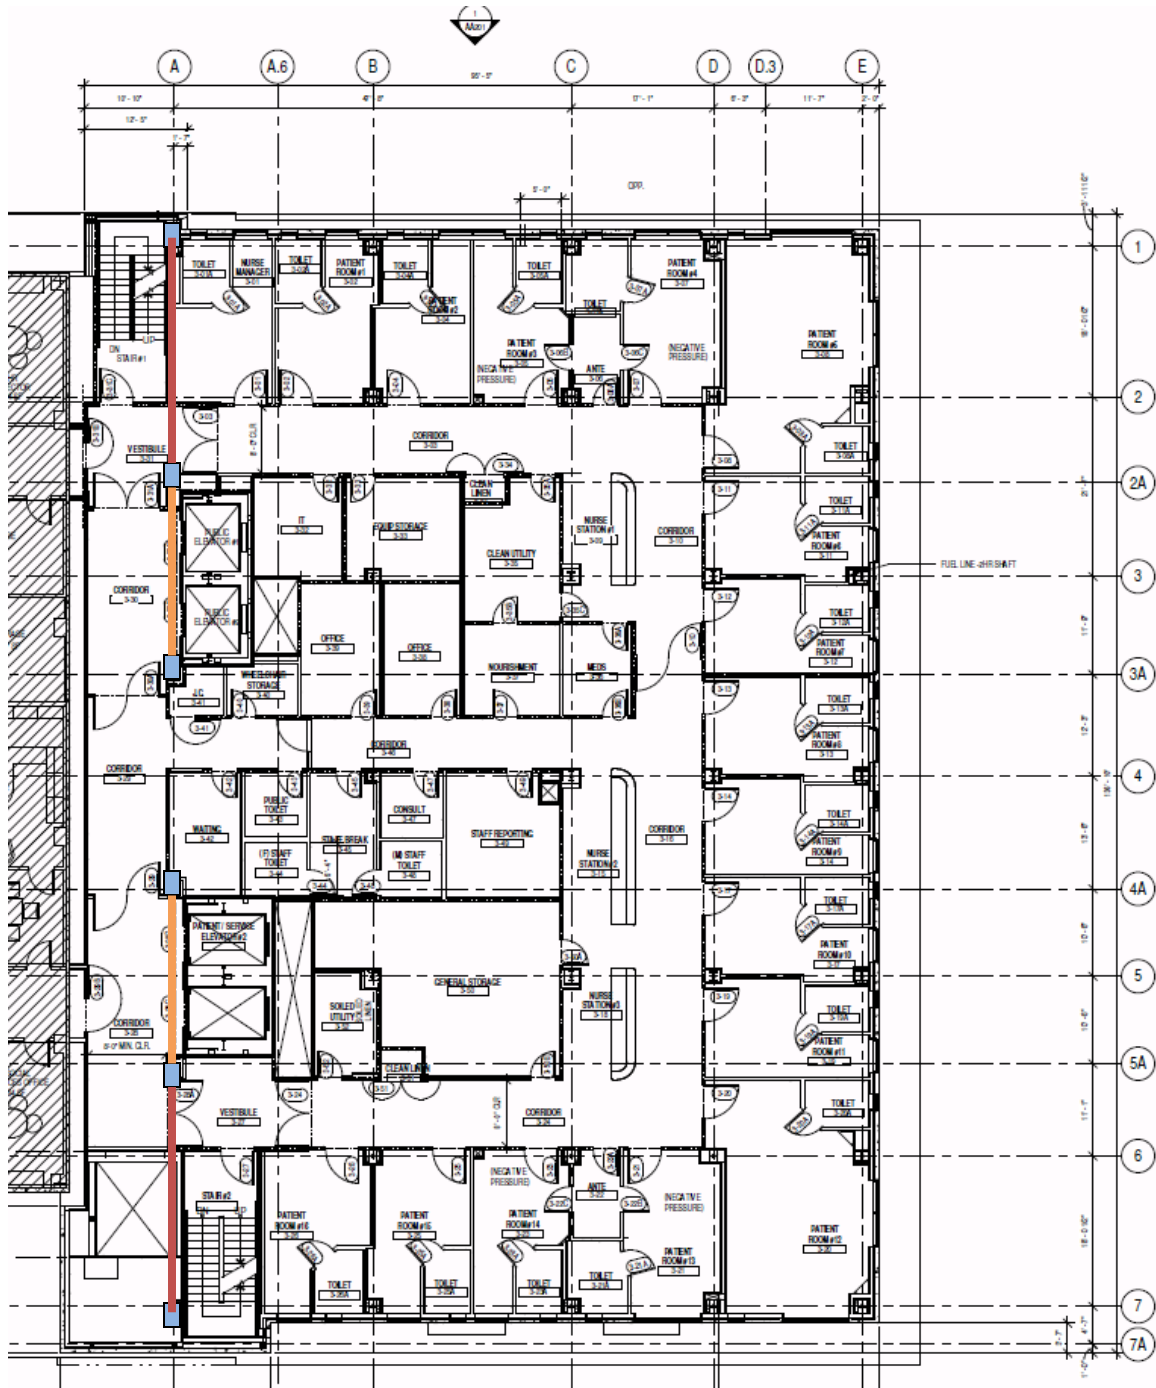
TYPICAL FLOORPLAN WITH COLUMNS IN BLUE, AREAS WHERE DAMPERS MAY NOT BE PLACED IN ORANGE, AND FINAL DAMPER PLACEMENT IN RED.
